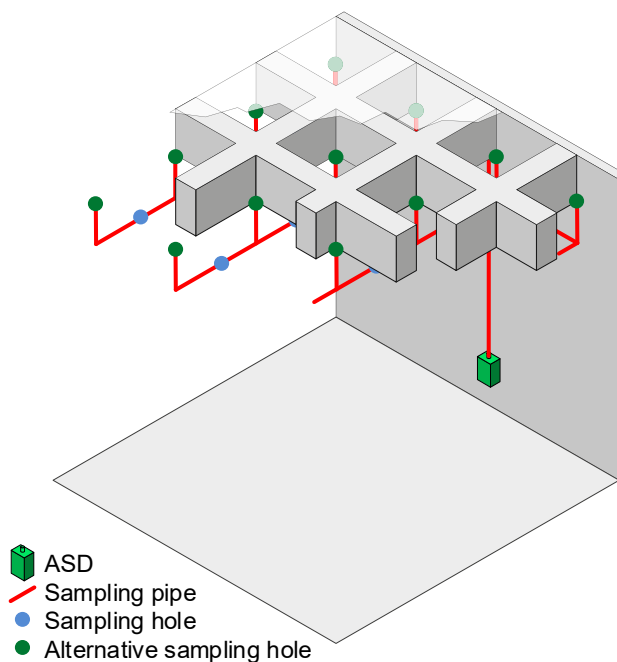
Fire detection placement (underside ceiling – deep beam/joist)
